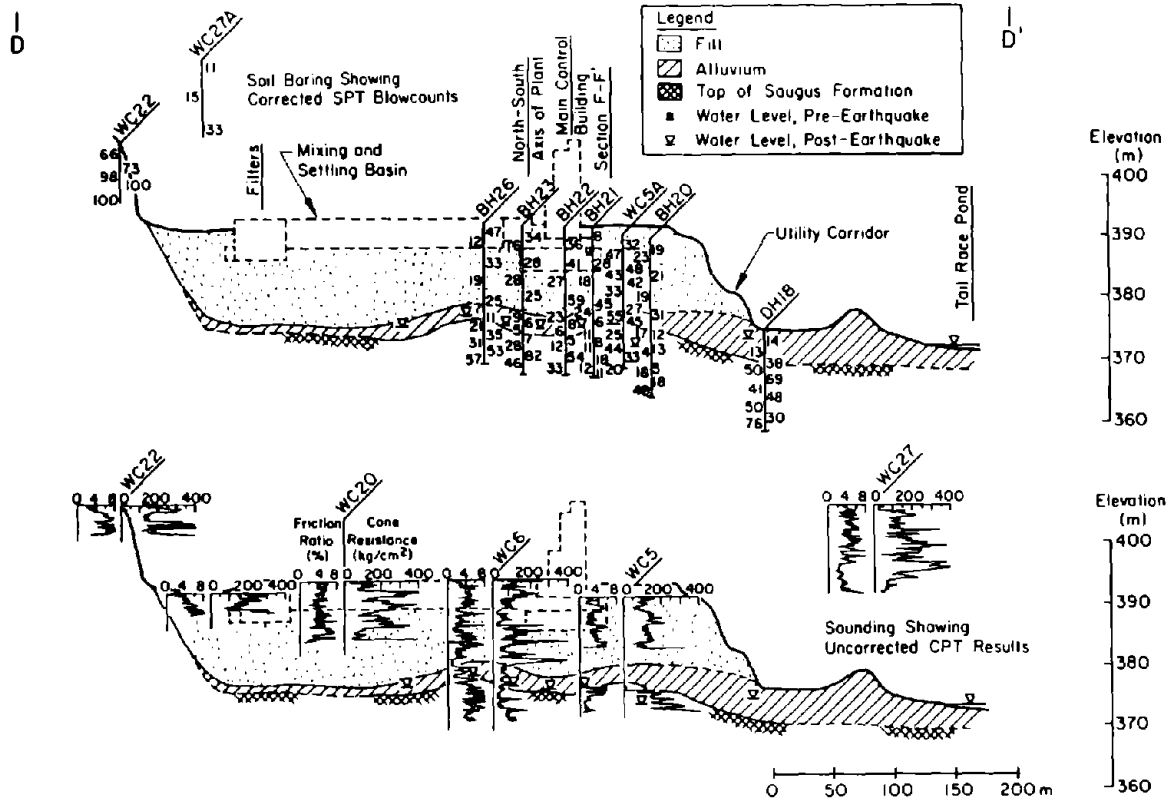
Soil Profile at Cross-Section D-D', Joseph Jensen Filtration Plant
